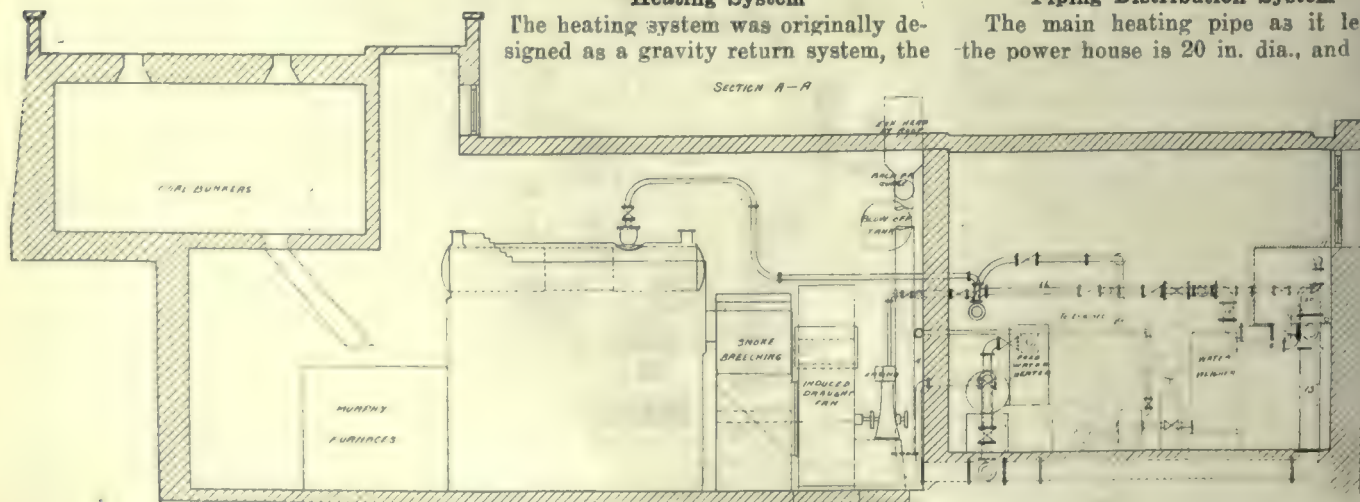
SECTION OF POWER HOUSE BUILDING SHOWING ELEVATIONS OF THE VARIOUS UNITS OF EQUIPMENT
